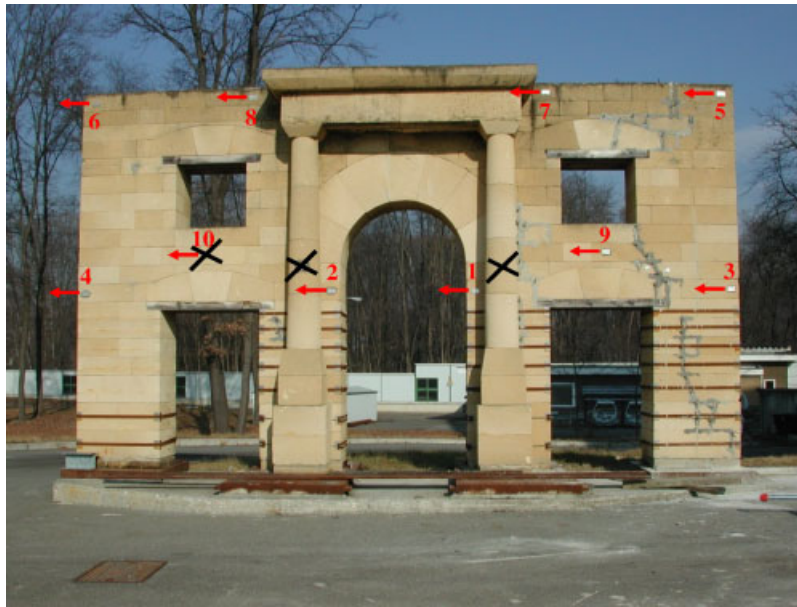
Undamaged state of the Geraci façade specimen, after the retrofit by mortar injections.
